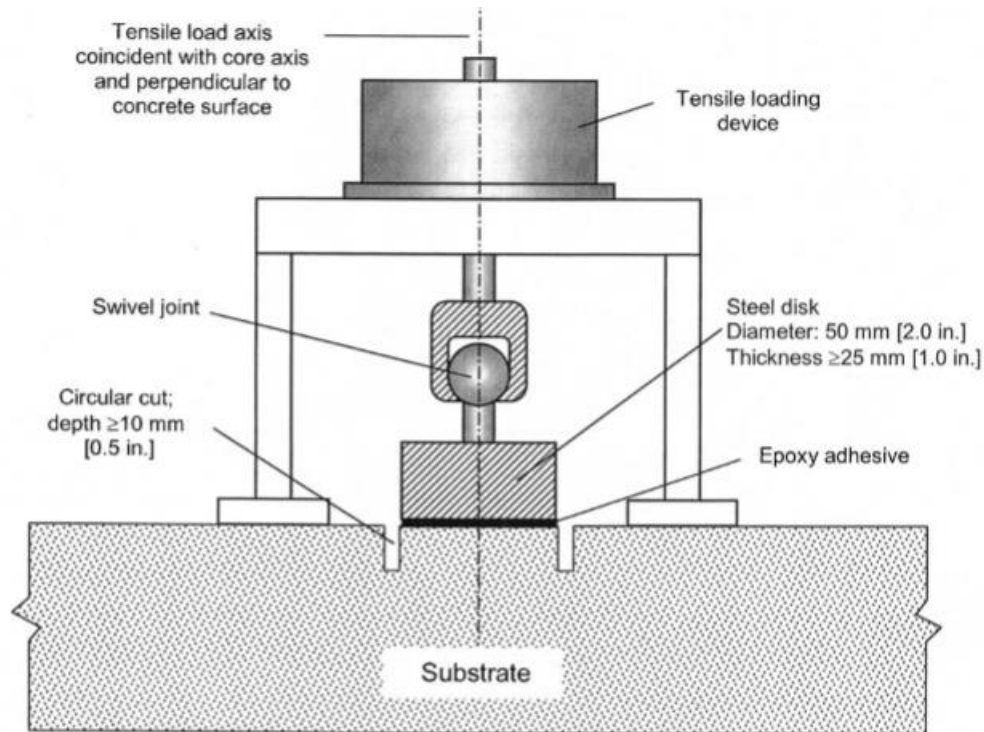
Schematic Drawing of Pulloff Test (Courtesy of ASTM C1583)
